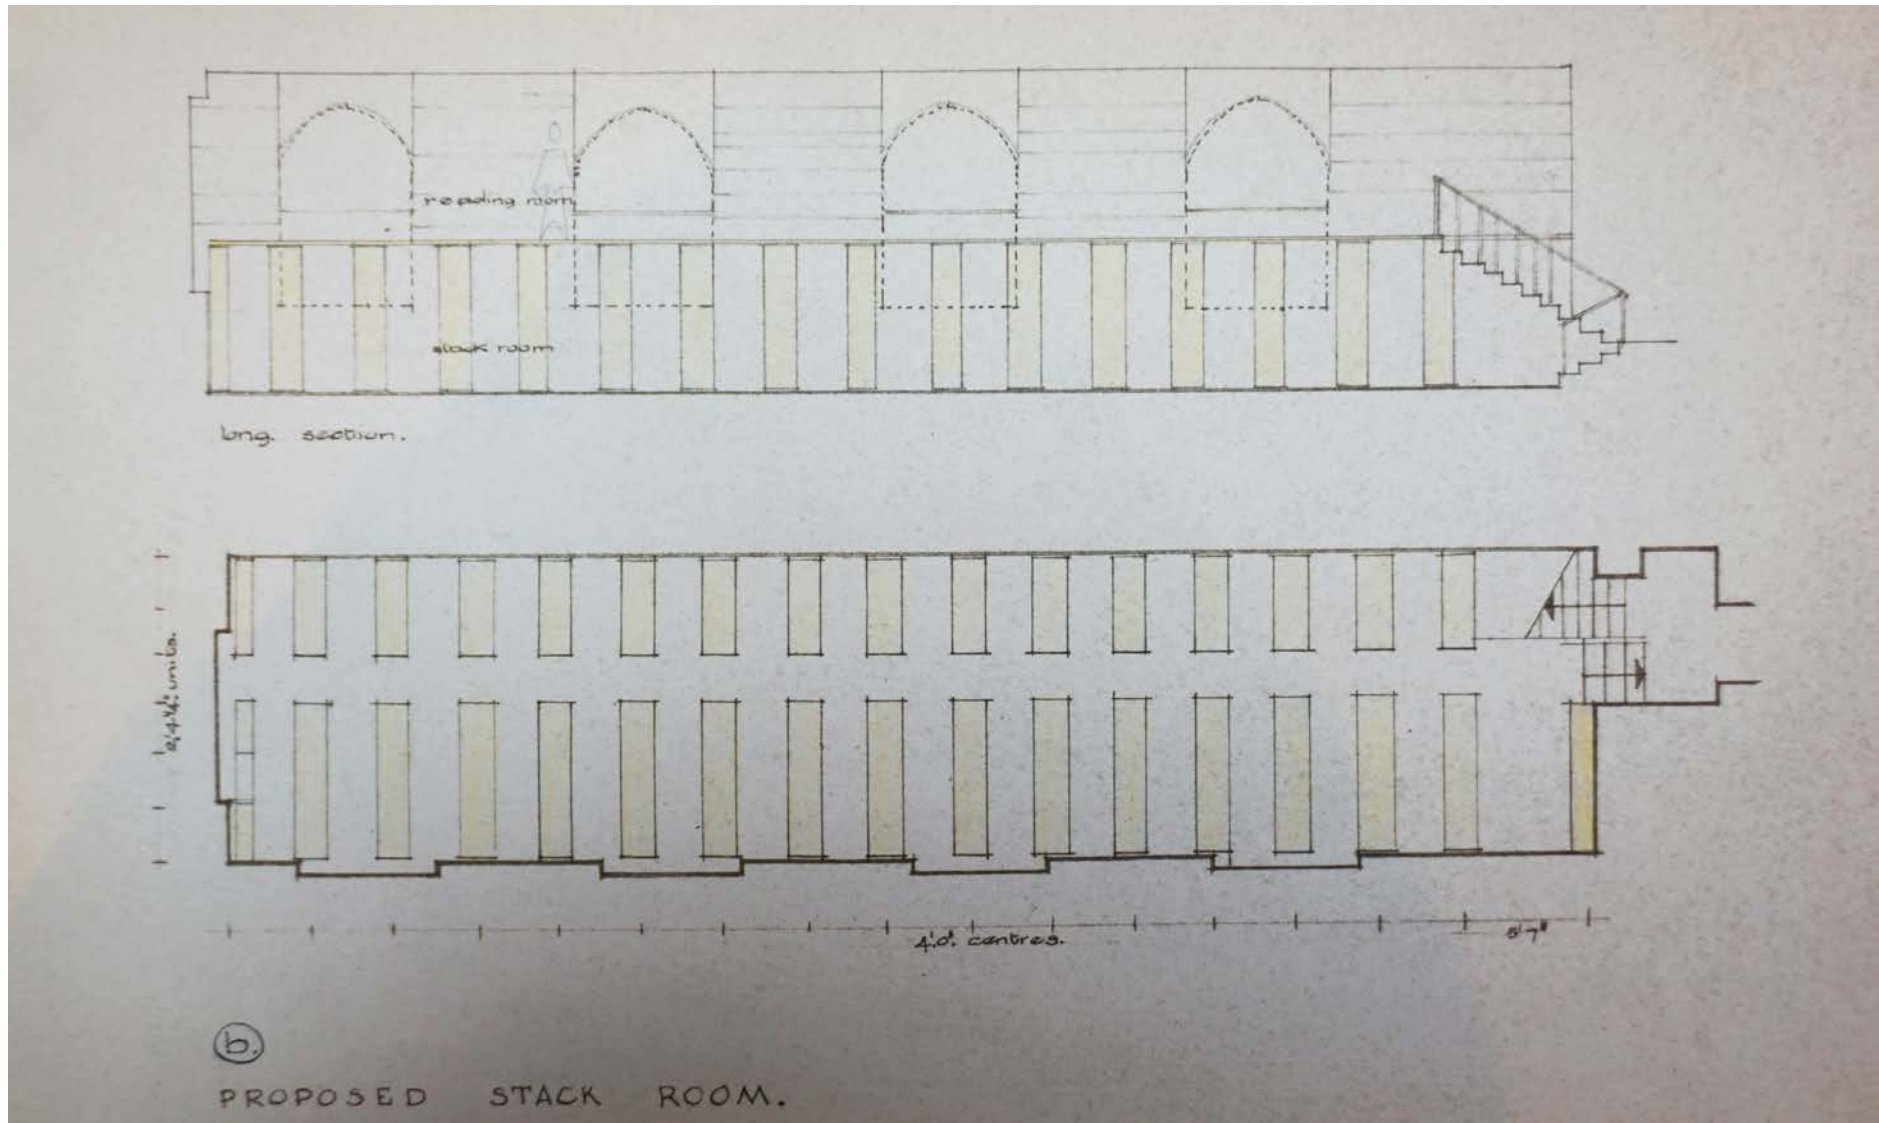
1957 sketch plan showing draft proposals to subdivide the Annex with a mezzanine, Fielding, Dodd and Stevens (Exeter College Archive)
